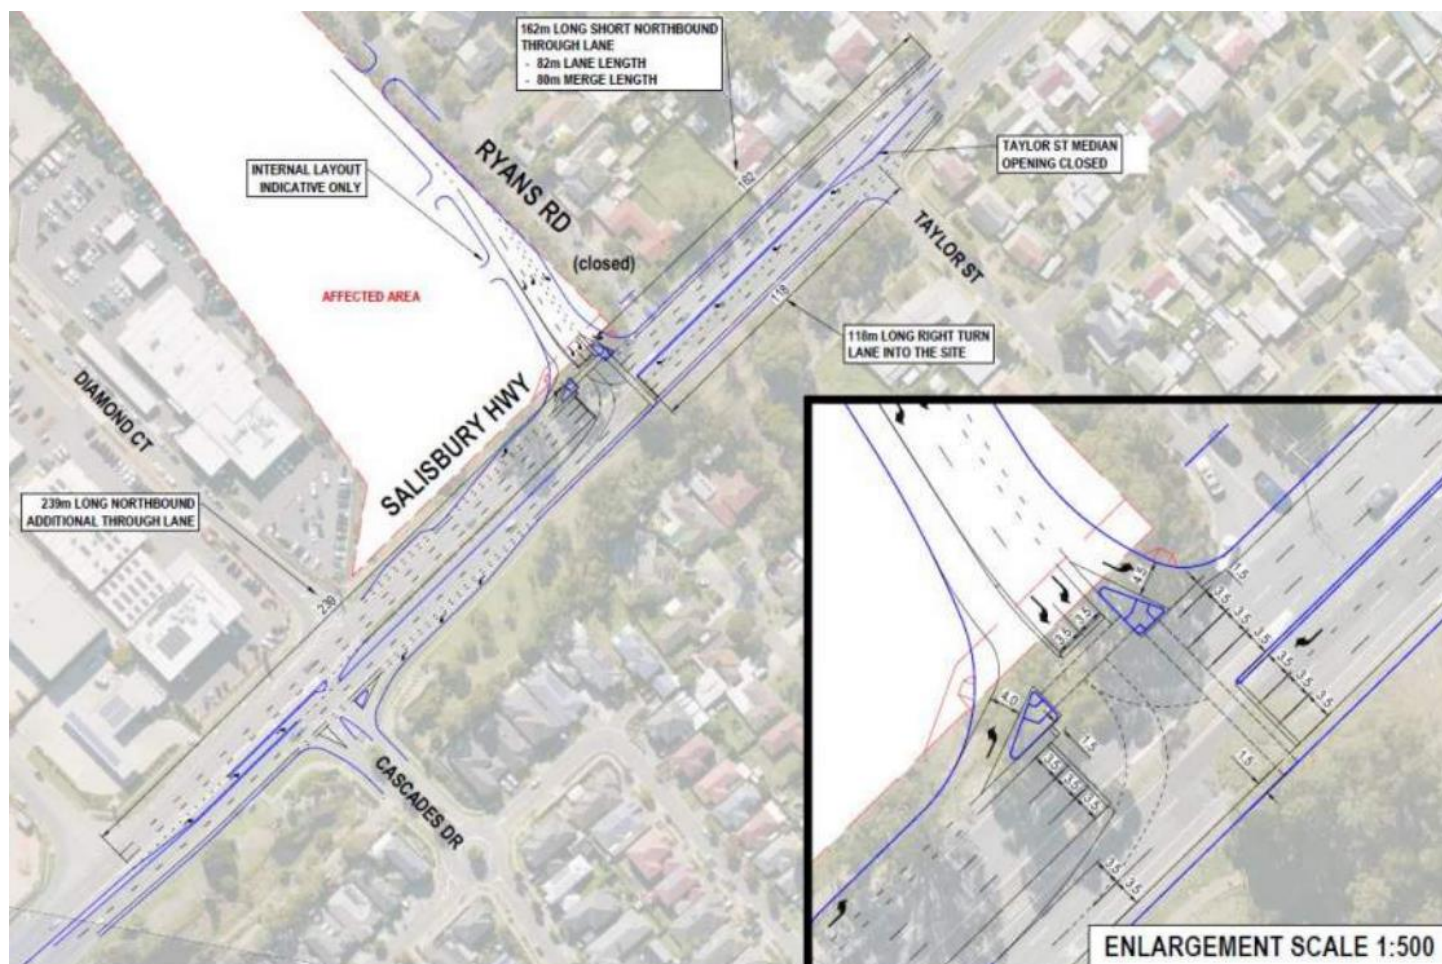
Concept plan of new traffic Lights immediately south of Ryans Road and Ryans Road being a cul-de-sac. This also involves left in left out only at Taylor Road.
